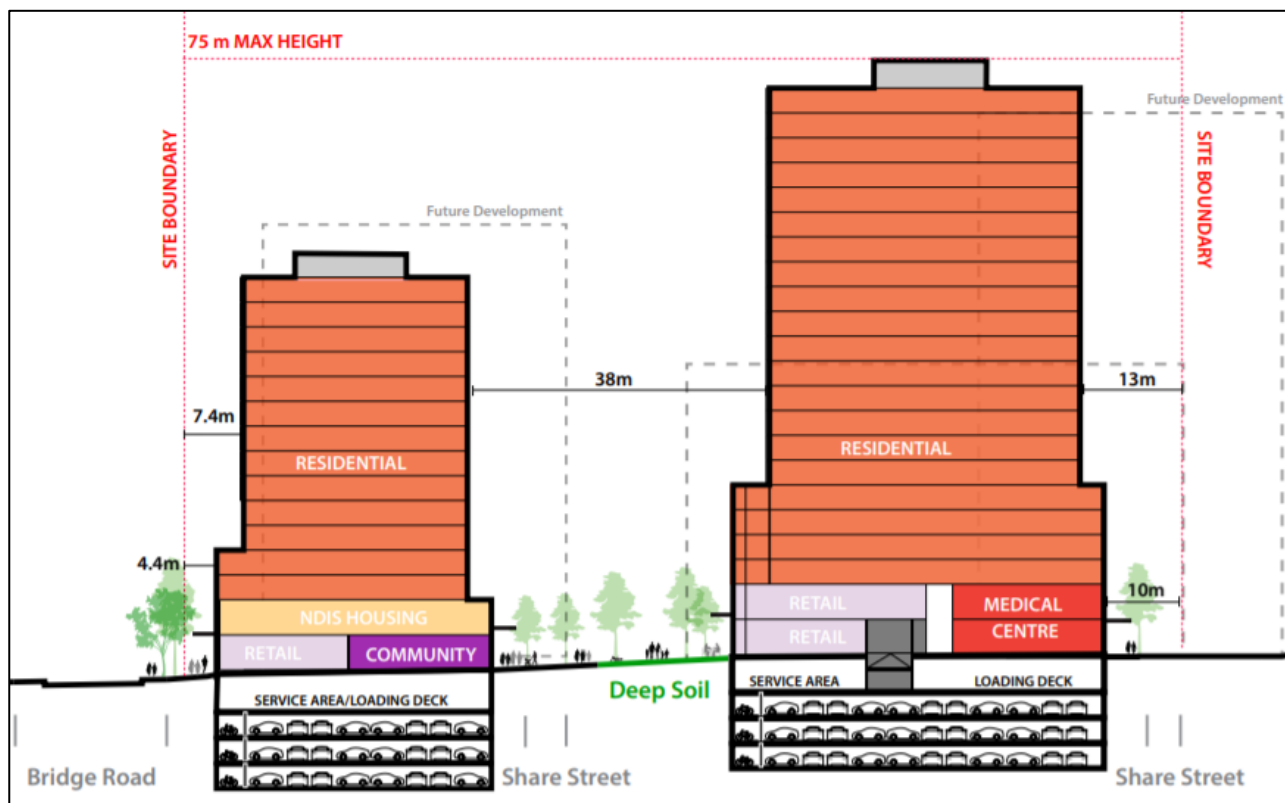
Base Case Height of Buildings for 93 Bridge Road, Westmead (Roberts Day 2020)
